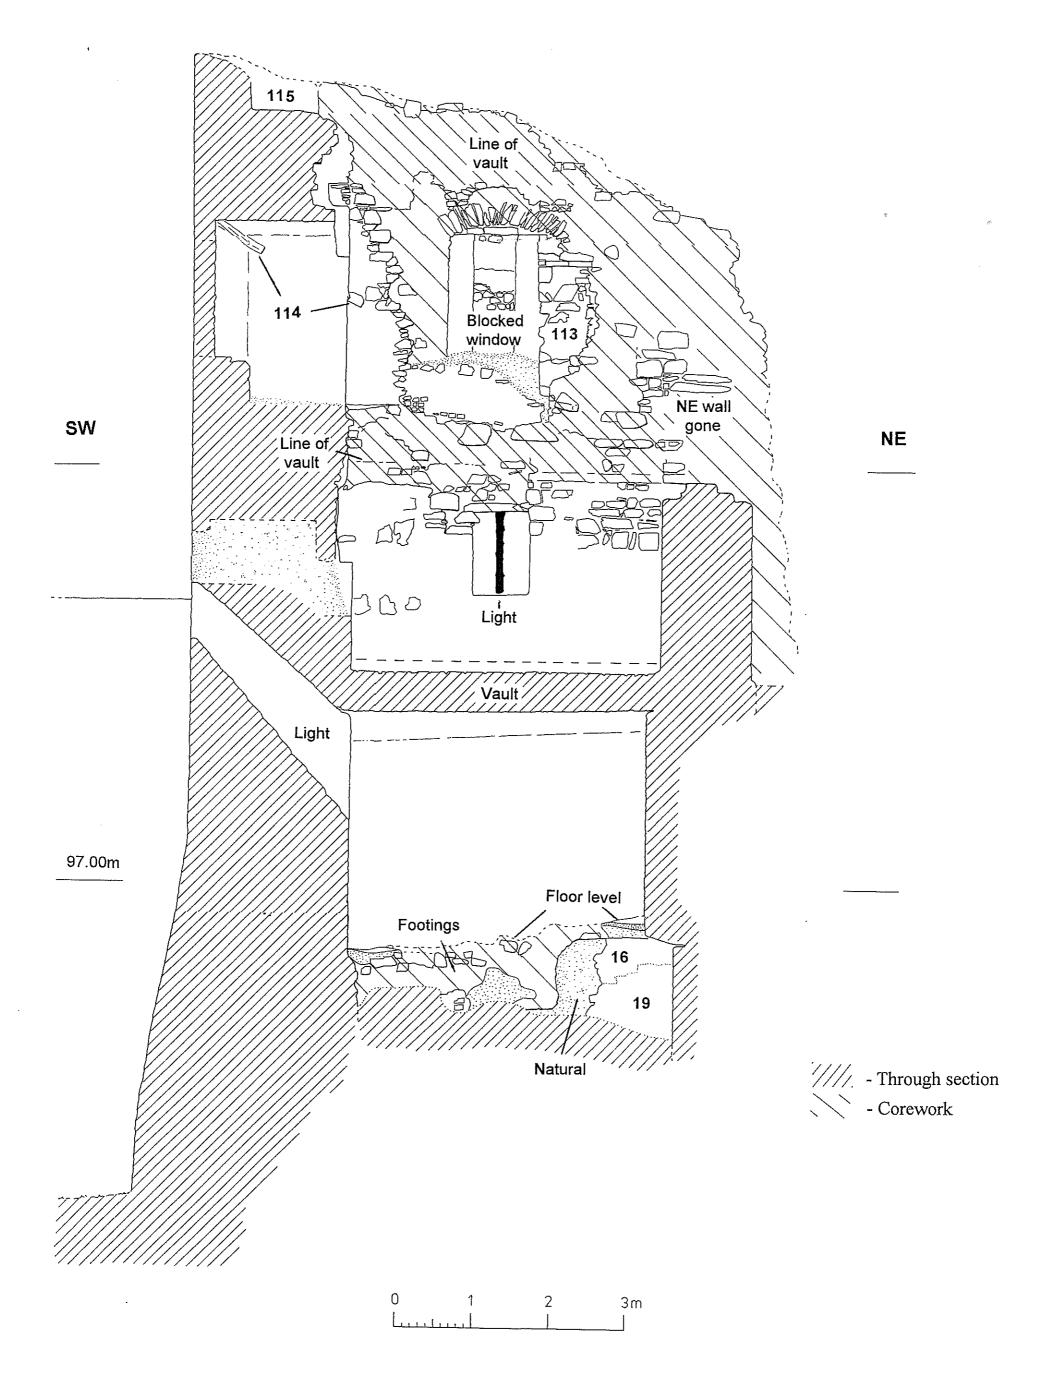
Carmarthen Castle SW Tower: North-west internal elevation
